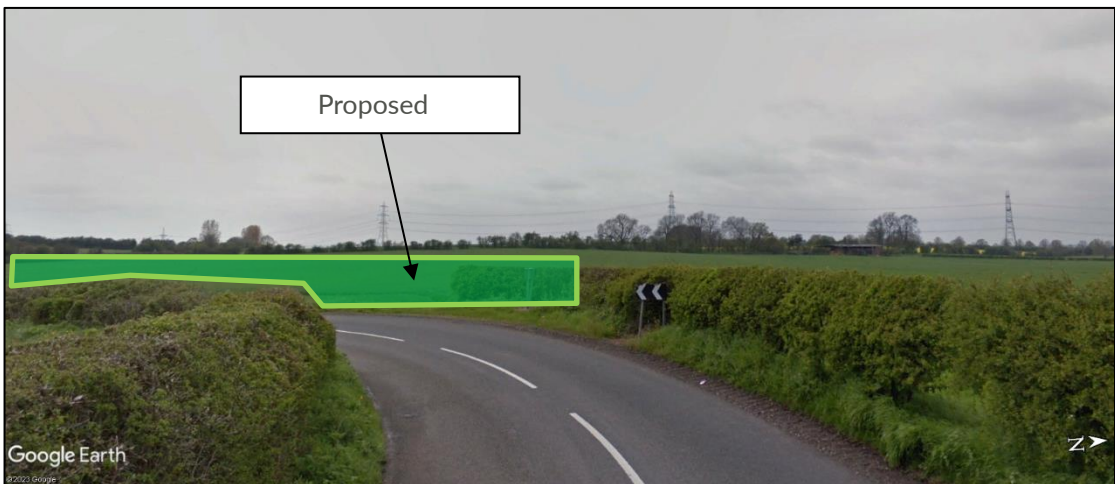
Viewpoint at road receptor 18 – proposed development straight ahead
